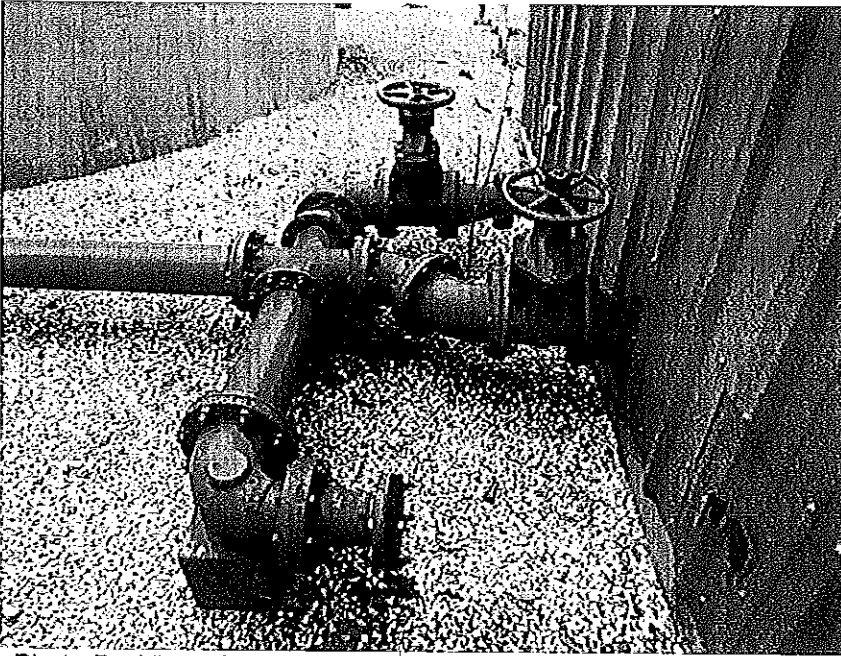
View of steep pipes located between ancillary structure and concrete water tanks.
